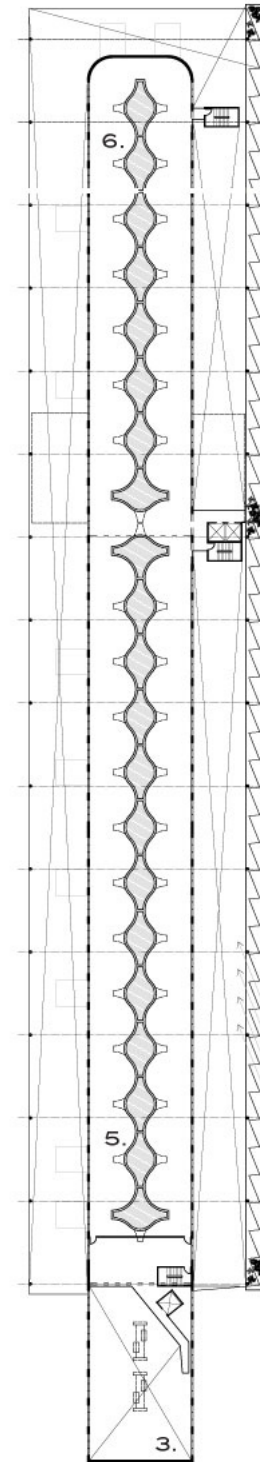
Roof plan prepared for the Central Glass Competition by author, 2006. The interpretive centre is located at the base of the plan.
